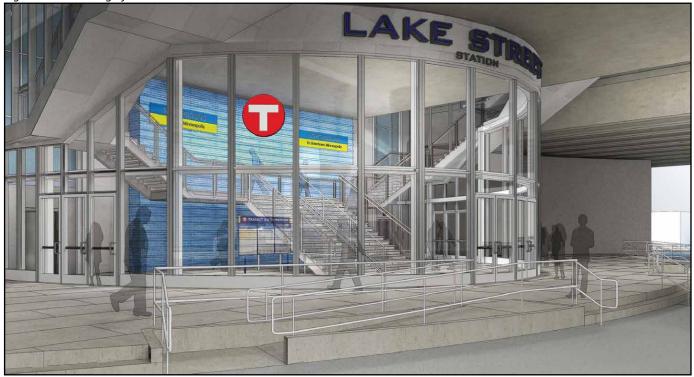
Rendering of Lake Street Station Plaza at Street Level
